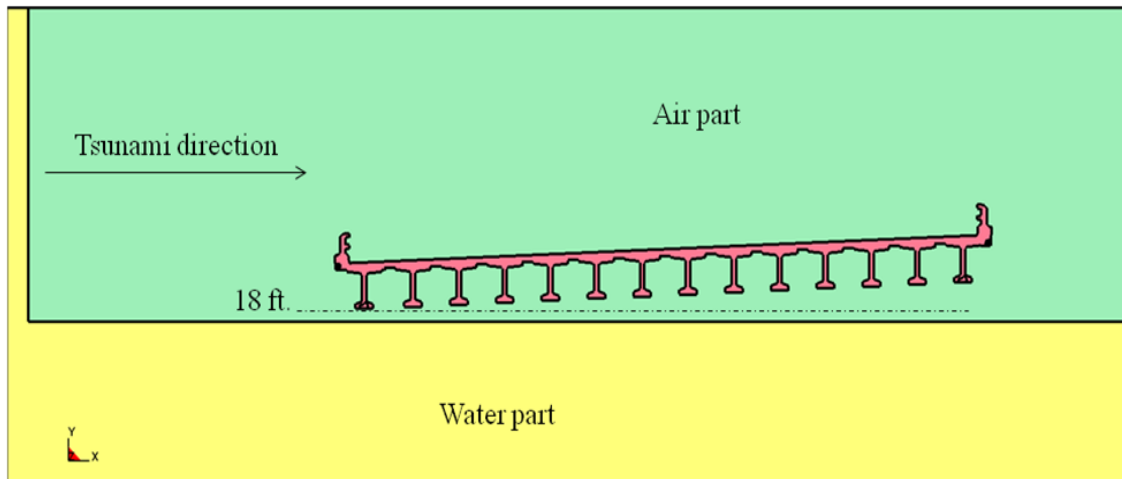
Simulation model of Schooner Creek Bridge (deck-girder) cross-section with one-inch thickness in z-direction
